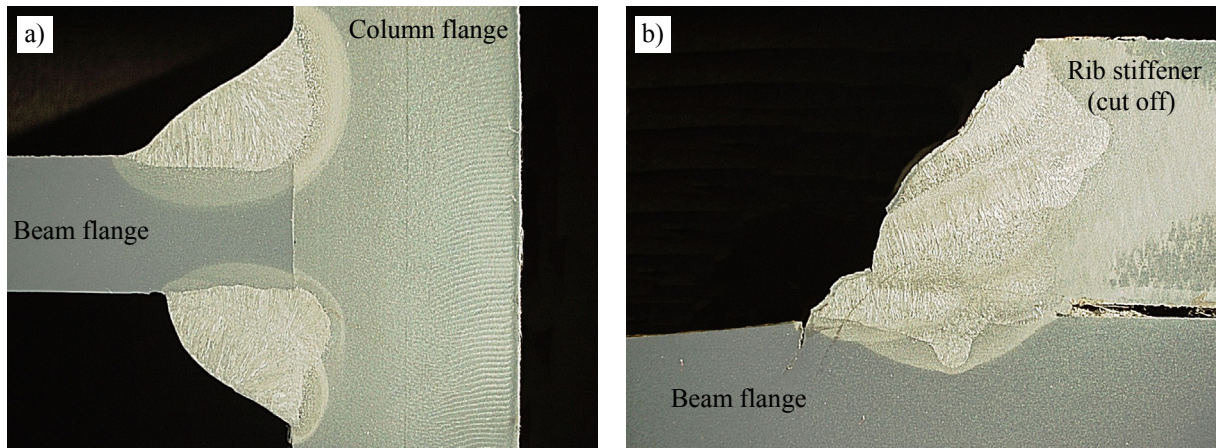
Cross-section of welded connection details from specimen RS2.2: a) Fillet weld between beam flange and column flange b) Fillet weld at the end of the rib-stiffener
